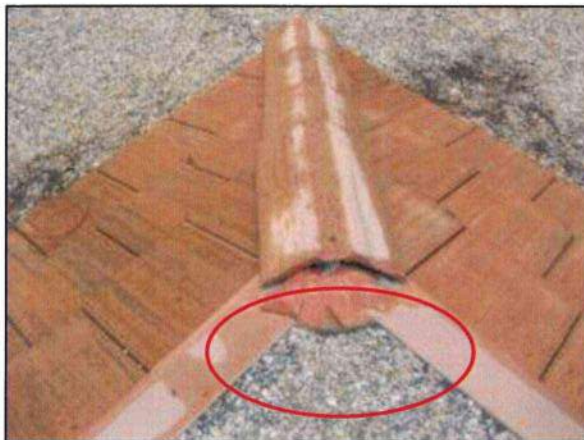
Fire Station #4 Separation of the roof tiles from the cement based sealant was noted at various points.
